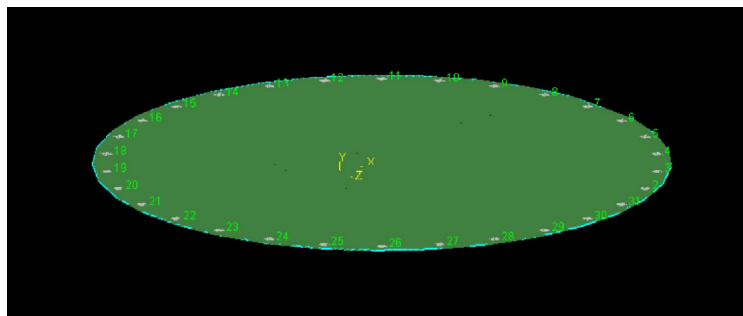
Raft foundation structure in STAAD foundation advanced
